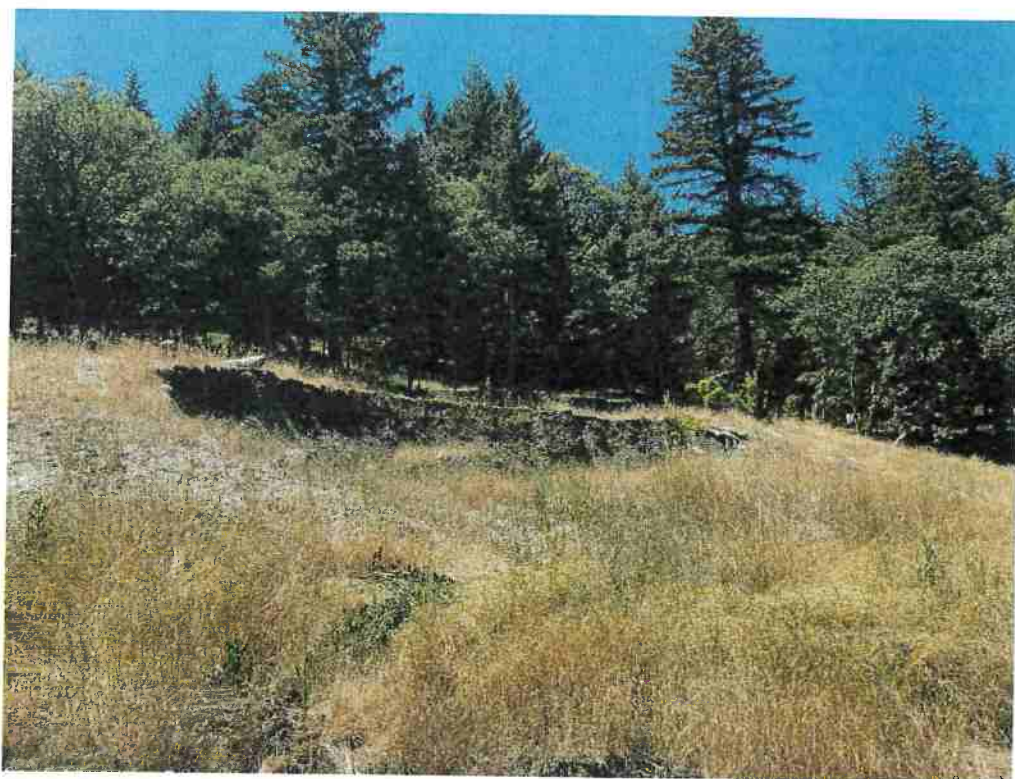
Observation Point 2(b) – Fillslope failure delivering downslope to Observation Point 2(c).
